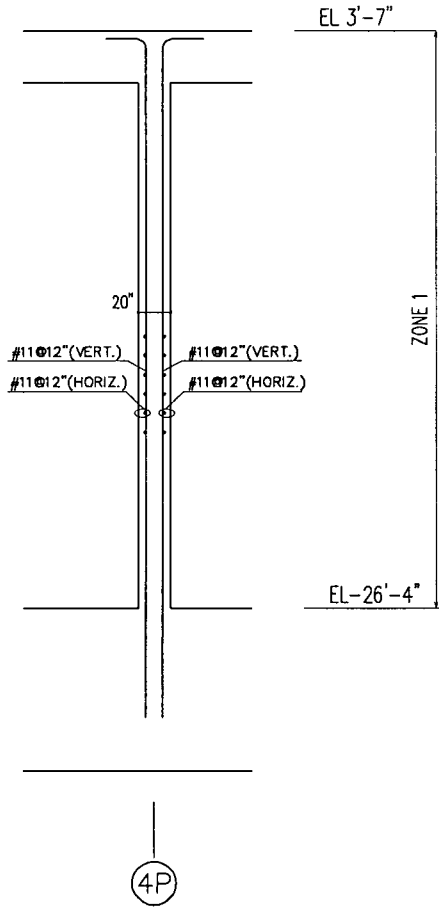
Typical Reinforcement in Interior Wall – SECTION 2
